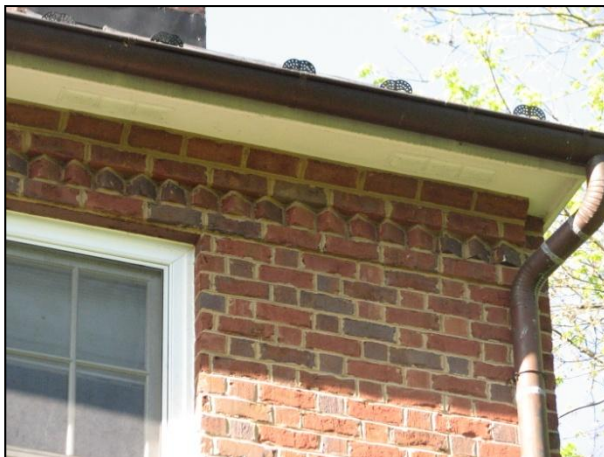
Brick corbelled cornice on the Dunne Residence. Also an example of rectangular vents in a boxed soffit.
